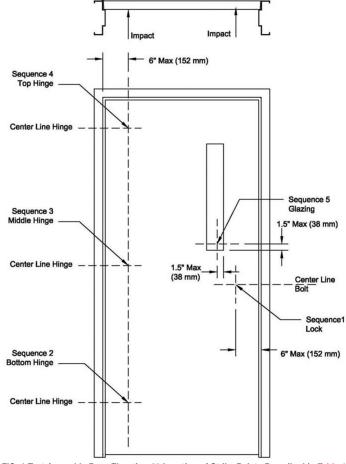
Test Assembly Door Elevation #1 Location of Strike Points Described in Table 1
